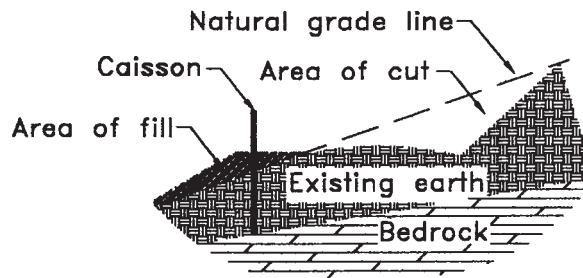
Caisson and soil buttress for destabilized slope detail.
